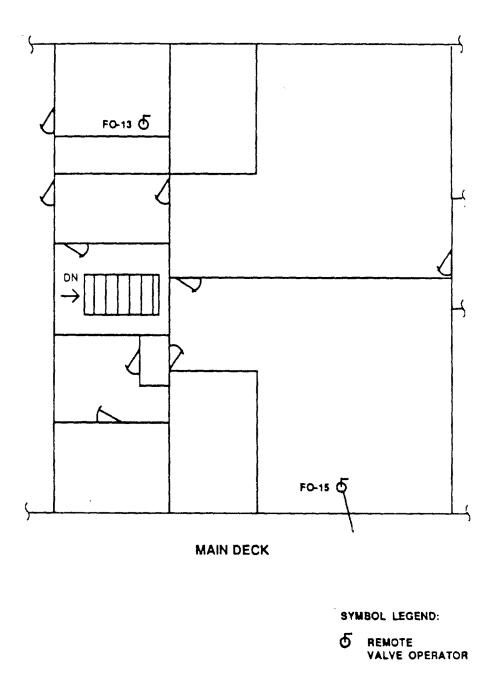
Electric Start Generator Valve Locations (Sheet 1 of 2).
